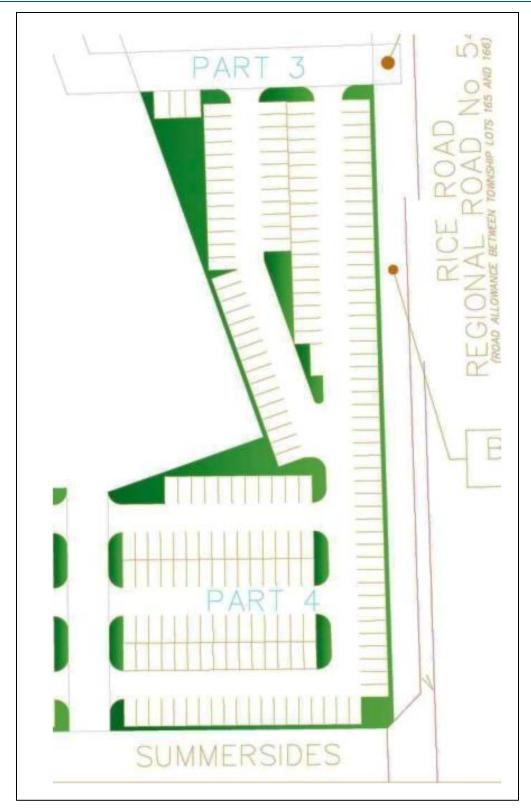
Example of Parking Lot Expansion (approx. 200 new spaces)
